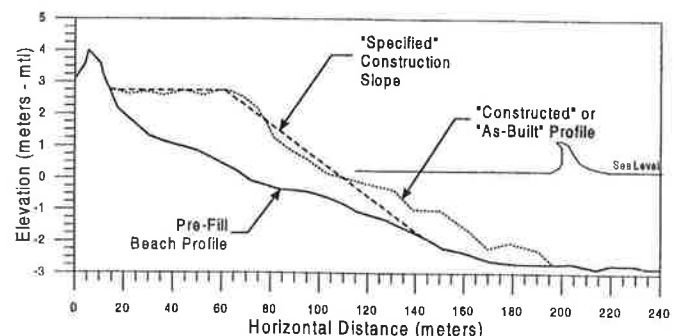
Definition Sketch of Typical Beach Fill Construction Template
